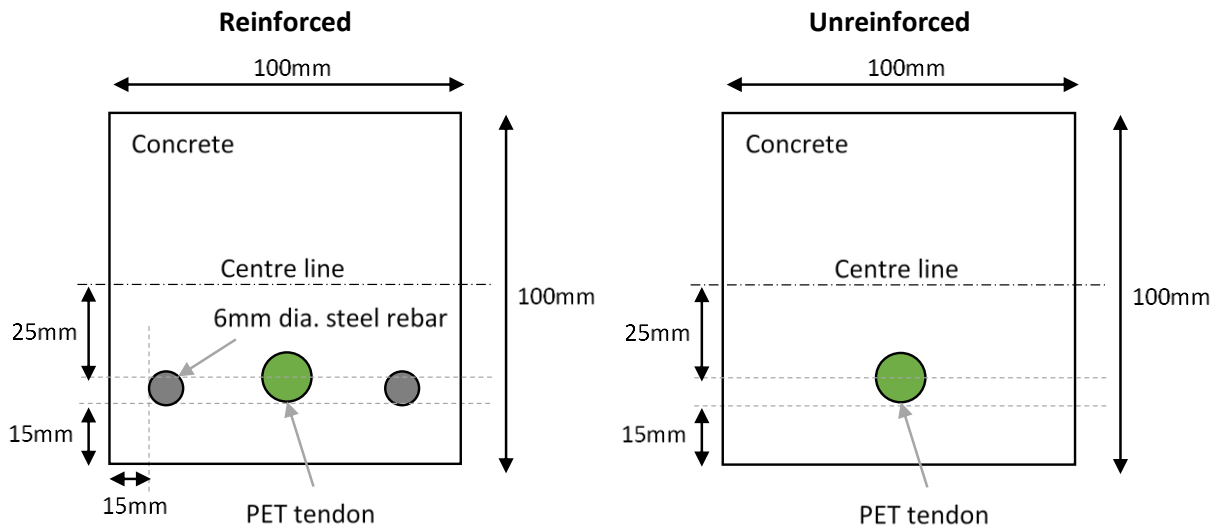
Cross-section of reinforced and unreinforced test beams.
